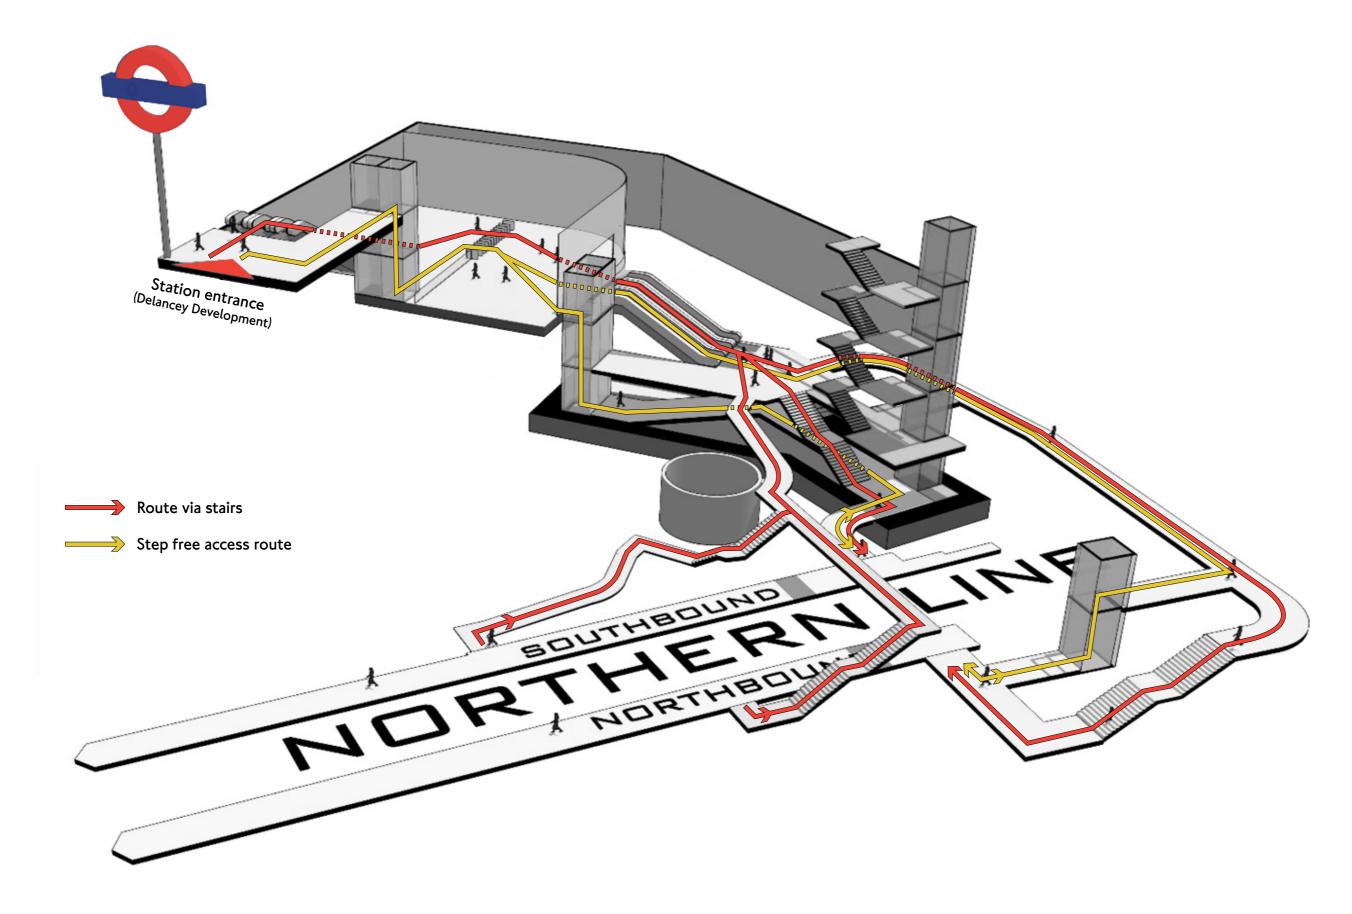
Indicative diagram of the proposed step free access routes and via stairs. Note one-way routes (via stairs)
